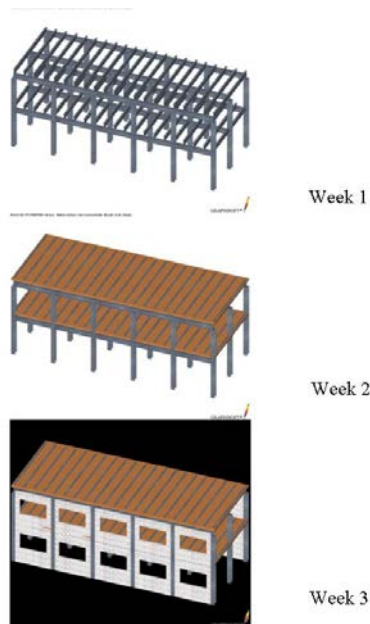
Building process (archive views of steps in building Dammerstock Gruppe 16, architect Otto Haesler, can be seen in Stein Holz Eisen. 1929. on page 769)
